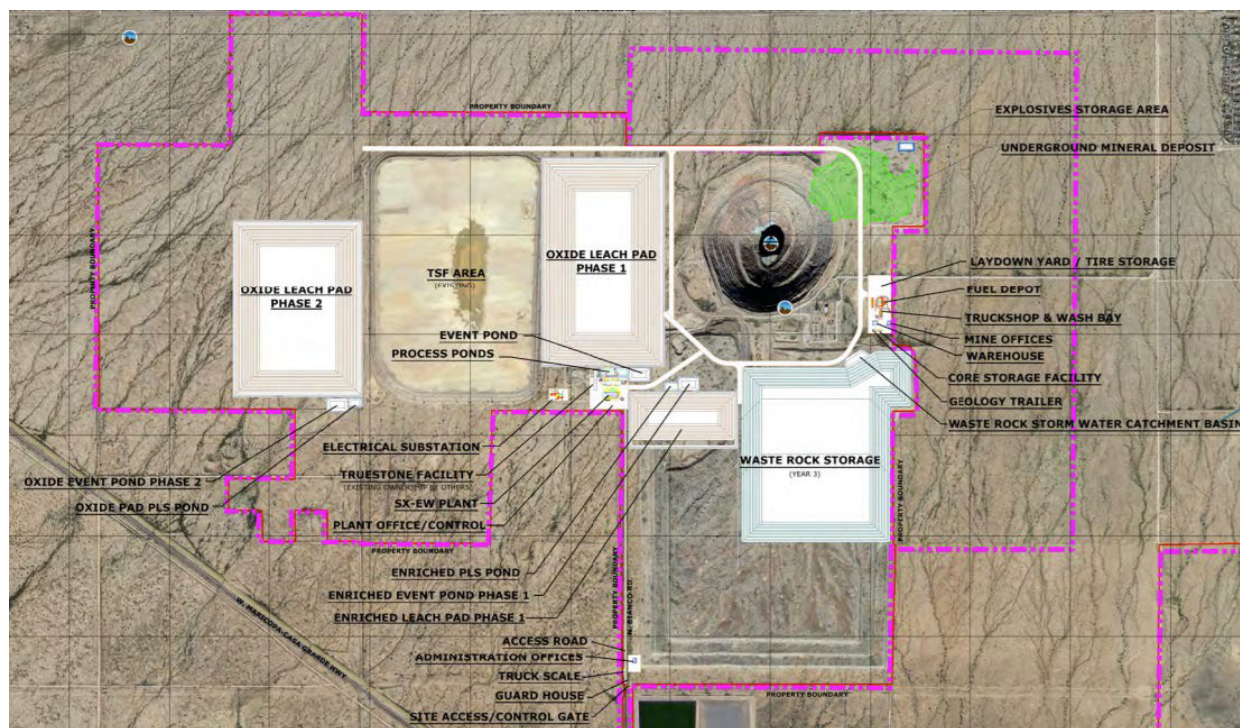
Phase 3 Leach Pad Construction, Waste Dump, and Site Configuration
